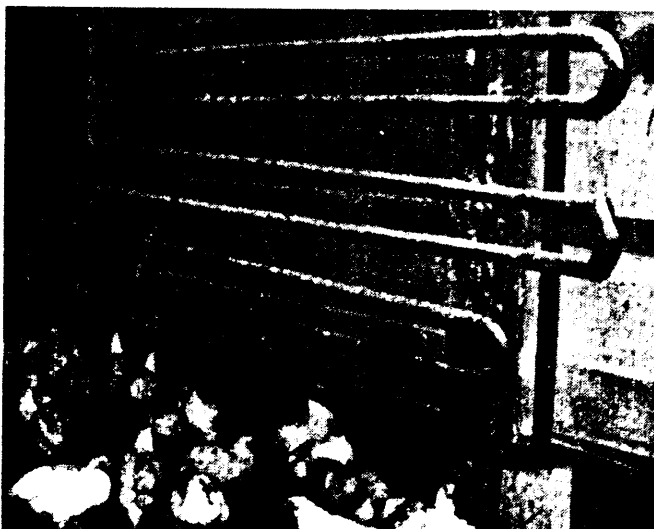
HOT WATER PIPES HUNG ON THE WALL
